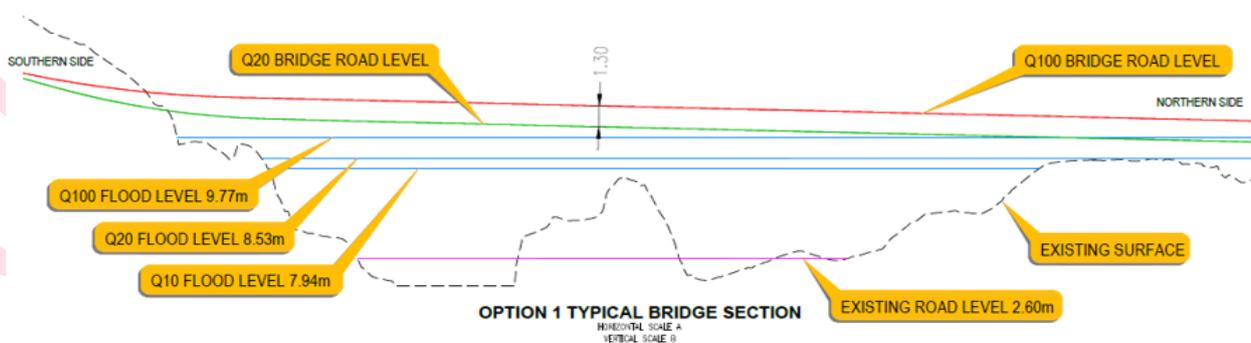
Typical Bridge Section and Flood / Bridge Levels
